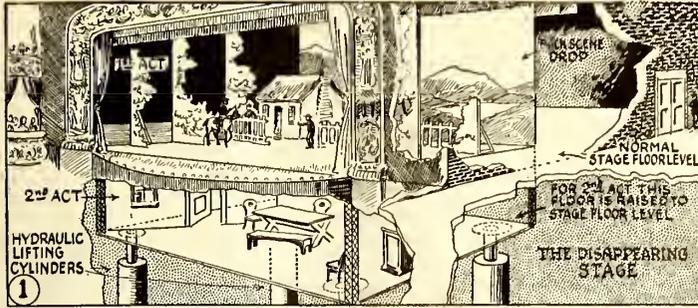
illustrates a rising and falling stage in use at one theater. Two platforms, each large enough to carry the stage setting as shown, are built in the form of a gigantic elevator; the top platform being separated about 20 feet above the lower platform, with steel girders at the ends and at the rear, where they will not show in the
